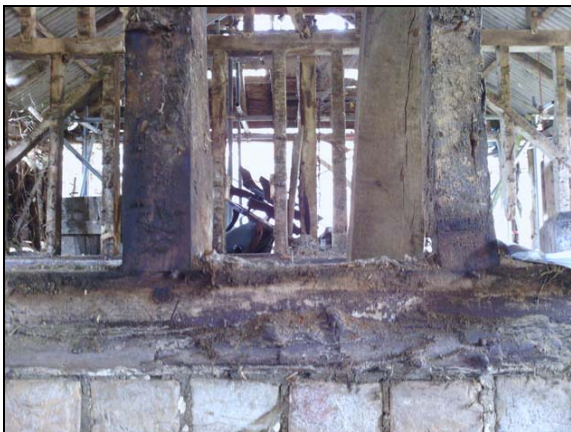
Carpenters assembly mark on east face of partition in Bay 2
